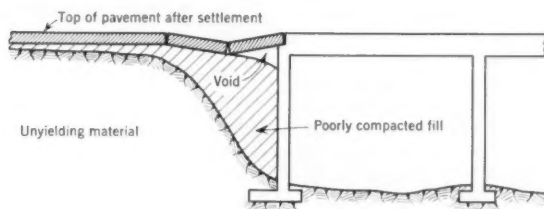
An approach depression has resulted from the construction of a short, poorly compacted fill between a bridge and a steep, rocky bank. To avoid this situation, eliminate the approach fill by lengthening the bridge, or reduce settlement by using high-quality backfill or by flattening the rock slope.
